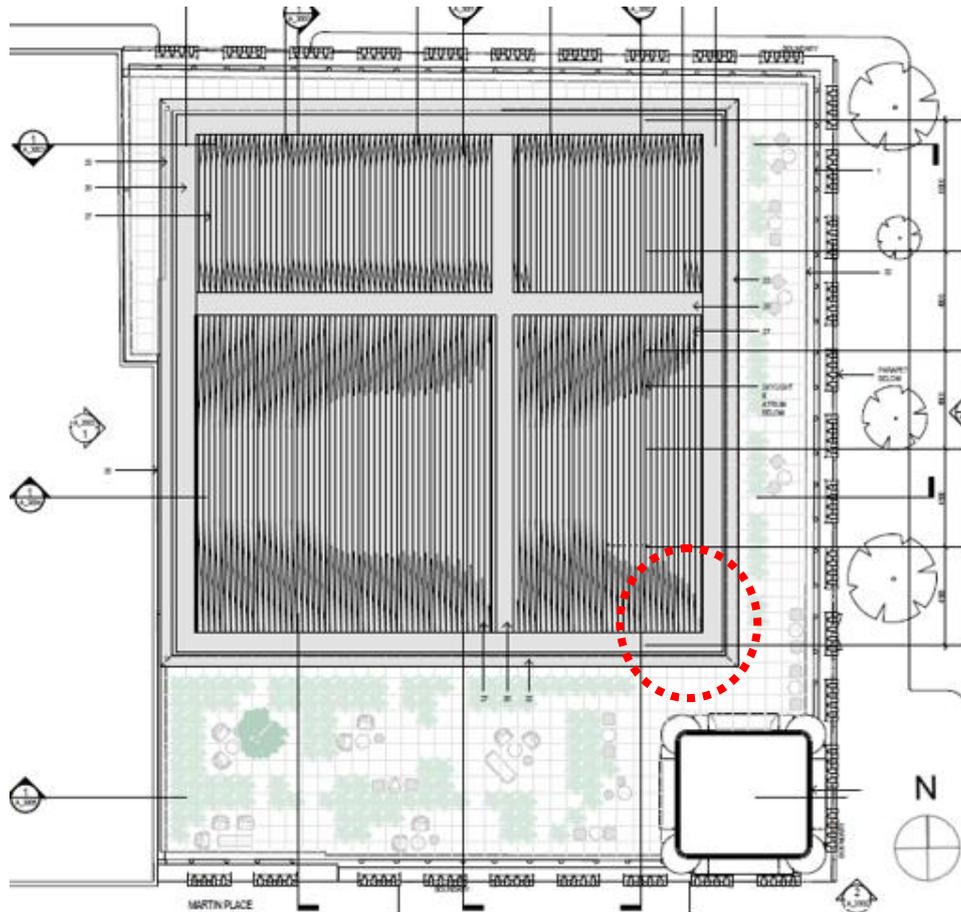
Roof level floor plan depicting approximate location of setback requested by the Heritage Council.
